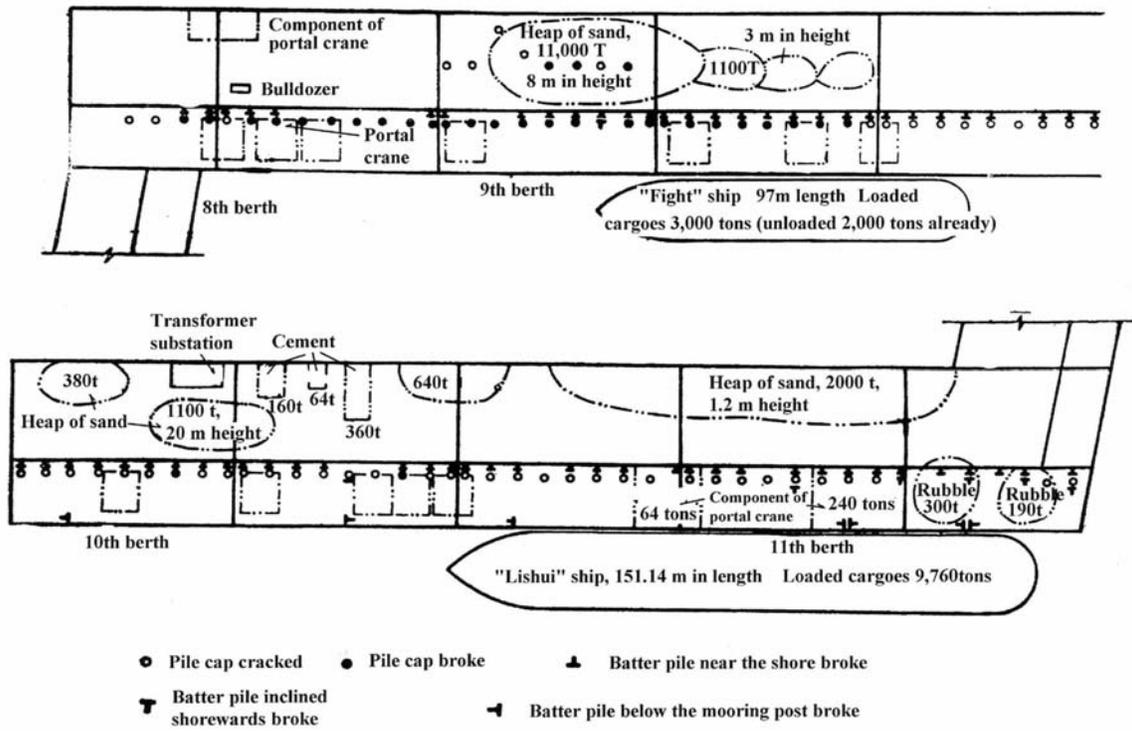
A sketch showing the load and damage to a pile foundation investigation for the No. 9 to No. 11 berths.
